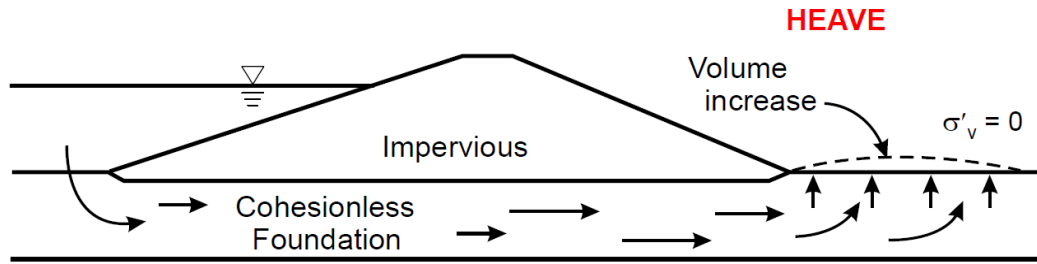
Heave at the Toe of an Embankment (Pabst et al. 2012)
